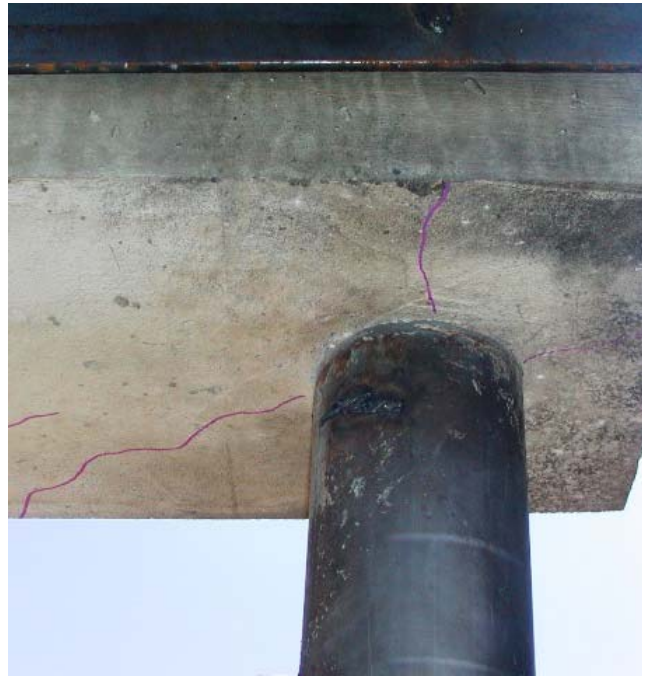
Damage at Cap-beam of Column B2-C6 after Test 9
